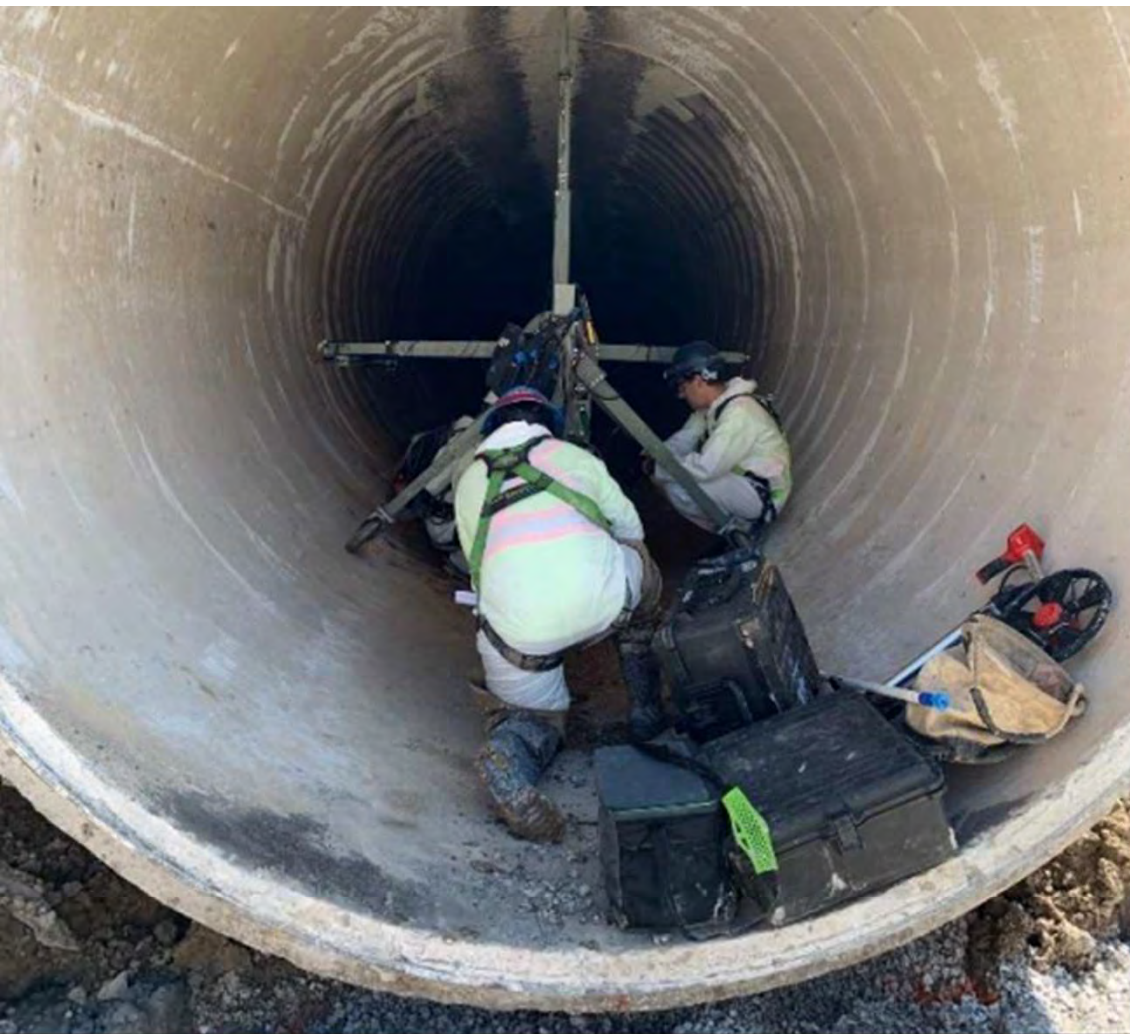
PICA crew completing the assembly of the NFT tool during the inspection of the East leg.
